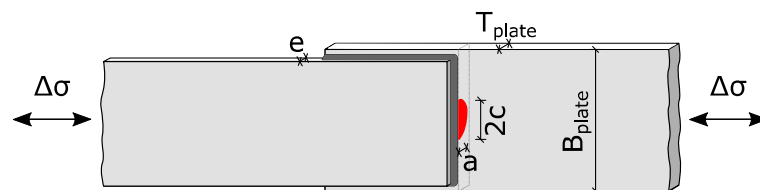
Dimensions of the cover plate detail and assumed crack for fracture mechanical analysis. The leg size of the fillet weld (designated by z in the text) is not shown here.
